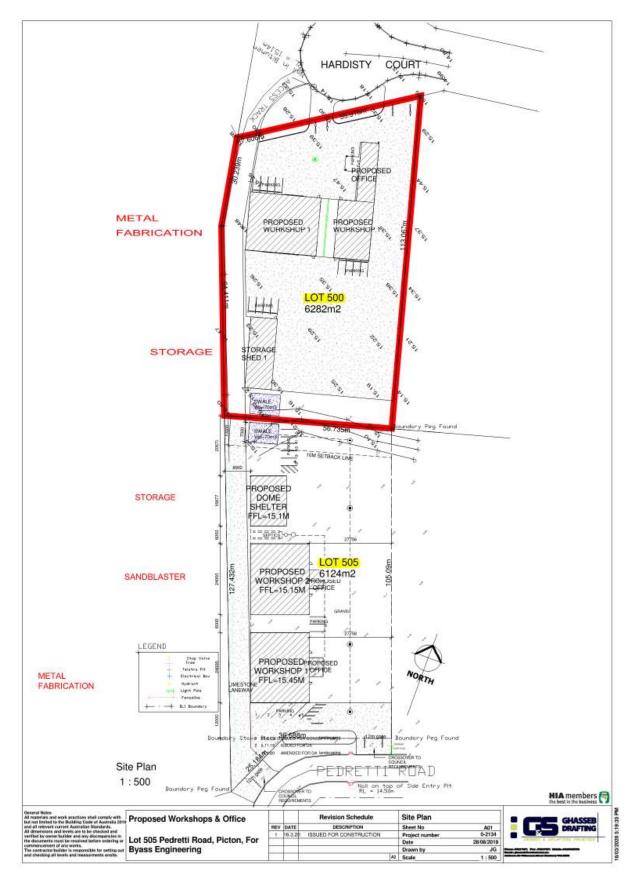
SITE OVERVIEW 2 (North top of page)
